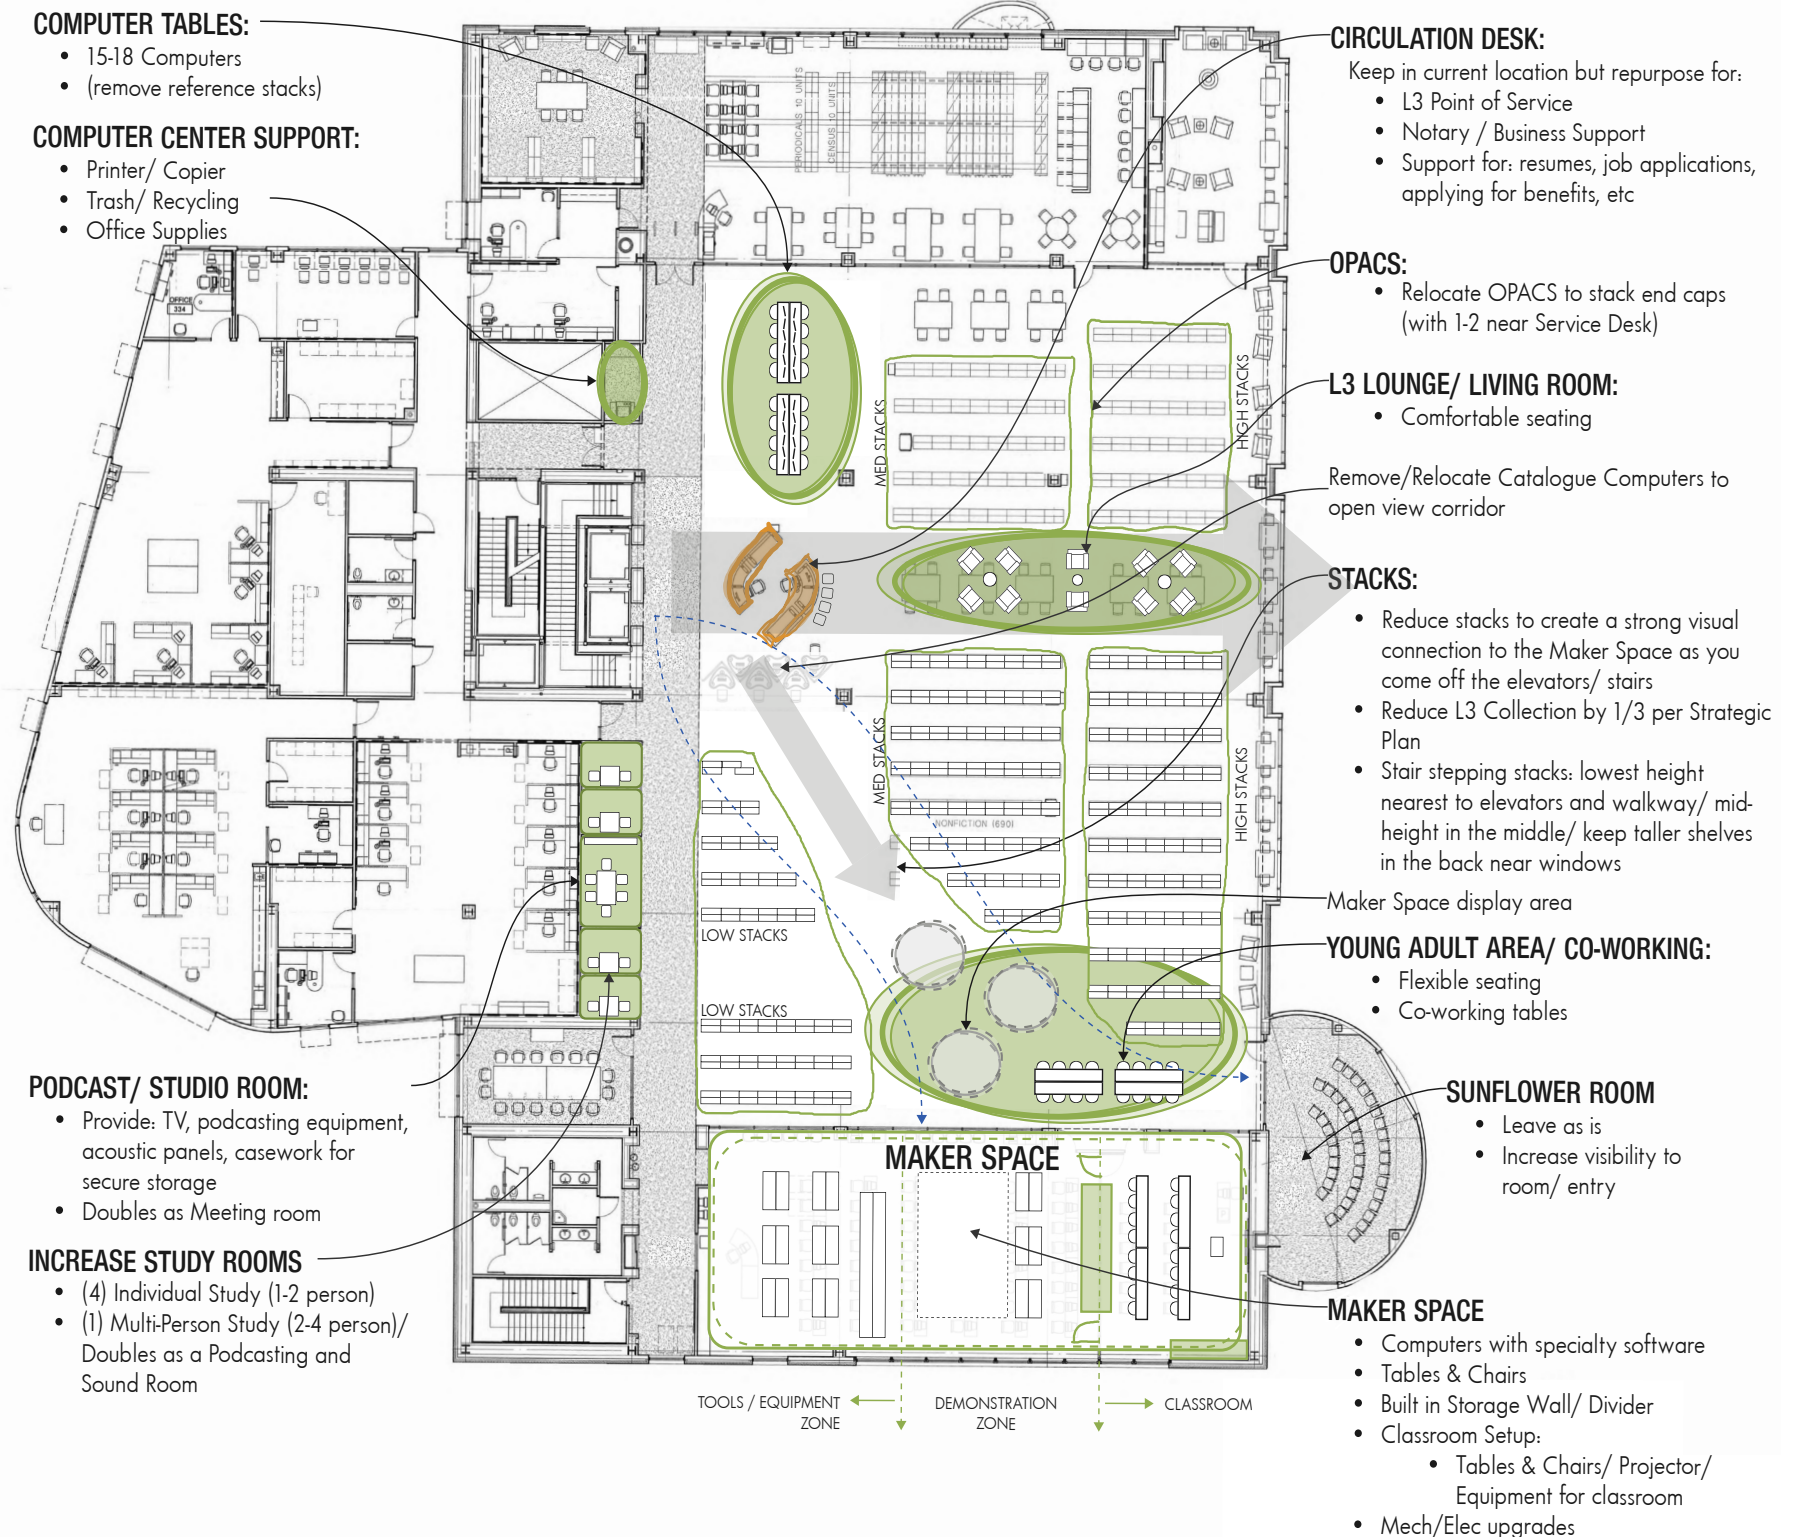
CHEYENNE BRANCH , THIRD FLOOR PLAN, OVERLAY BY JLG ARCHITECTS
